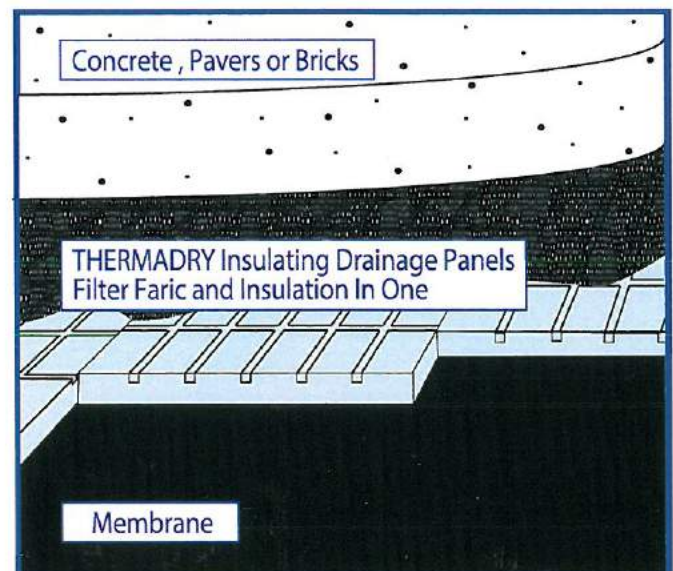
Simplified THERMADRY plaza deck assemblage
